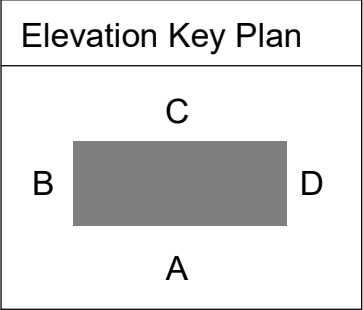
MULTIFAMILY ELEVATIONS
